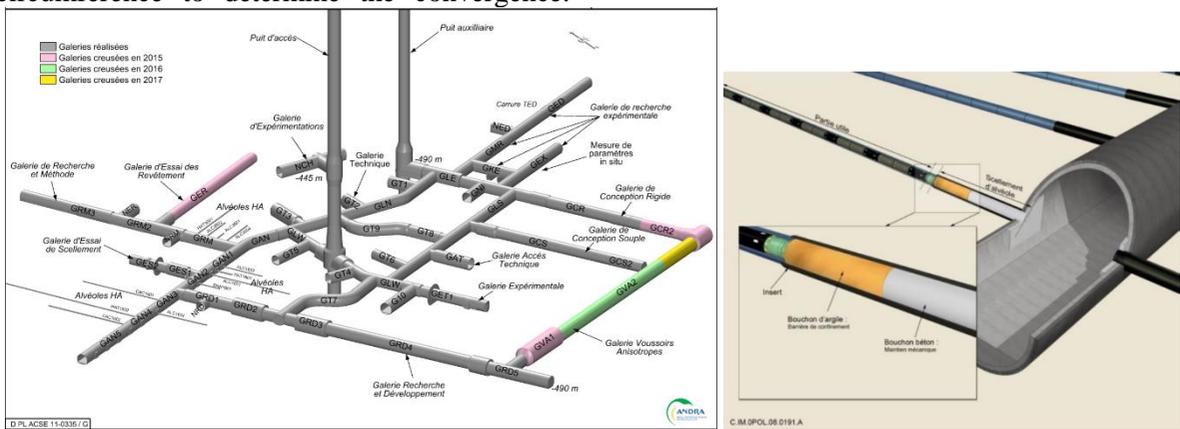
Layout of Andra underground laboratory galleries and diagram of an HL waste repository tunnel (2009 concept).
